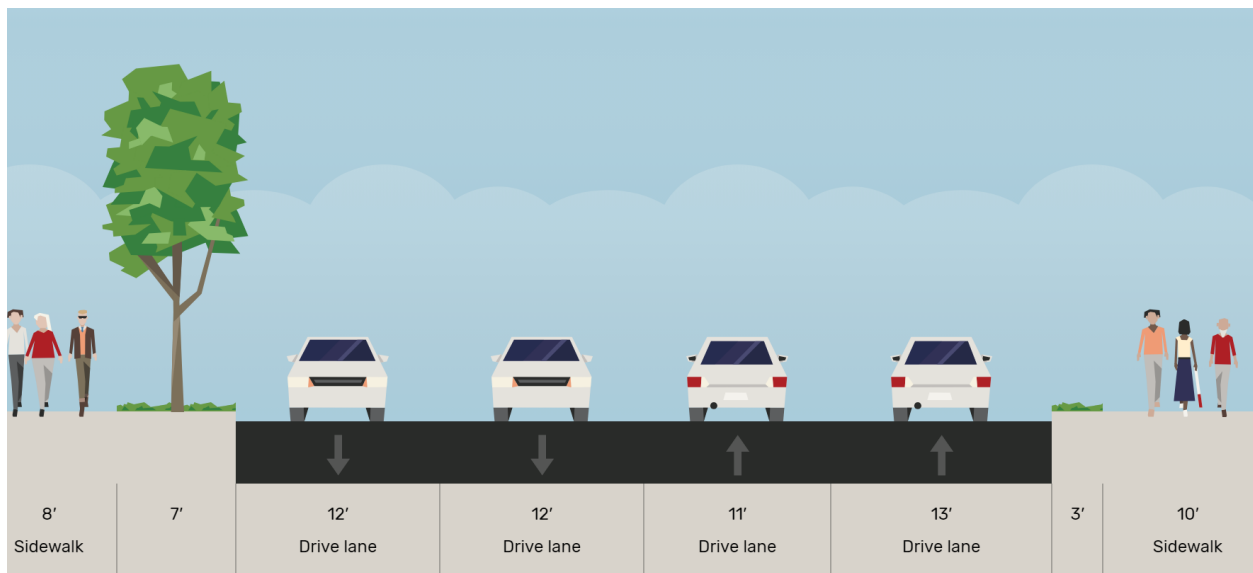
EXISTING HOLLAND LANE CROSS-SECTION FROM EISENHOWER AVENUE TO JAMIESON AVENUE
